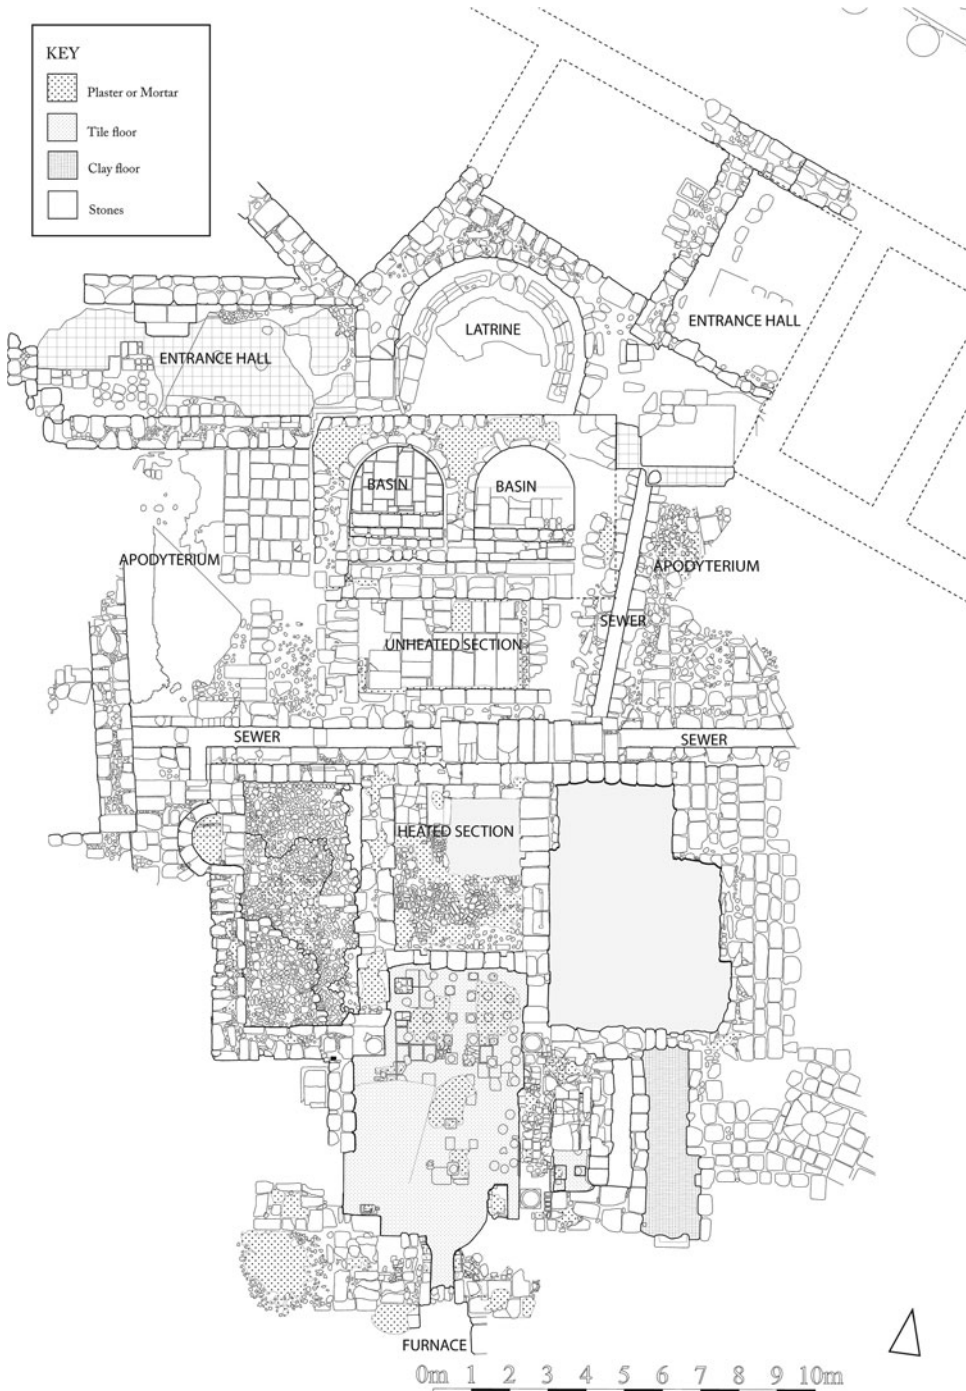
Plan of the Central Bathhouses highlighting location of latrine and bathhouse sewers. (Plan by Louise Blanke.)
